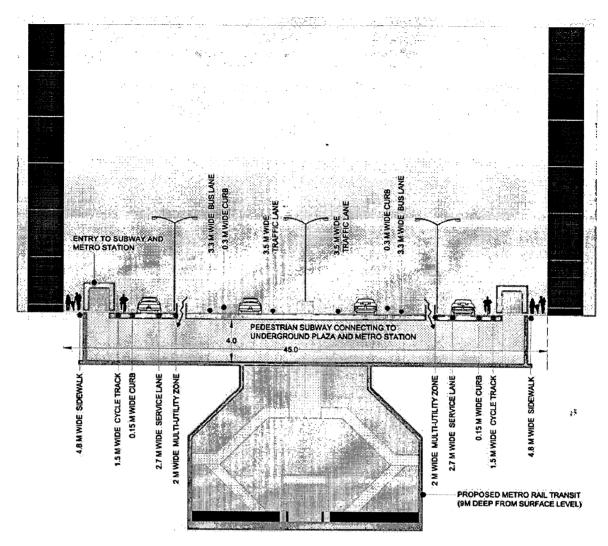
Section of proposed pedestrian subway at Binnys road junction Source: By Author
